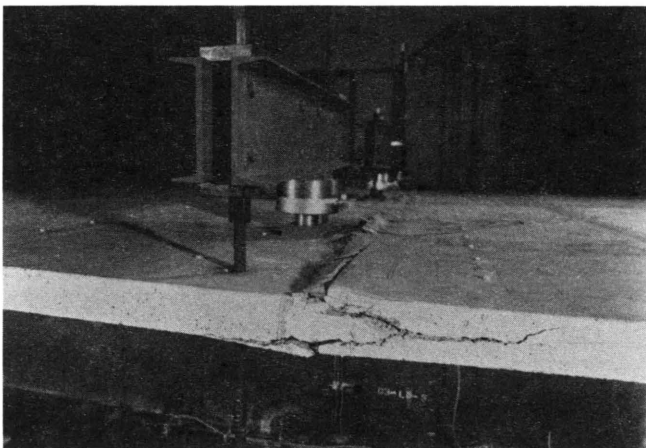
Crushing of concrete deck at 0.4l of west span.
